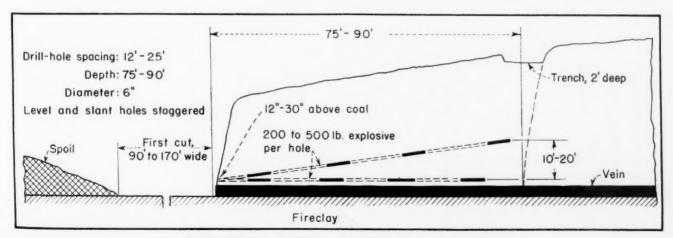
Shooting plan for blasting the overburden on the second pass.
